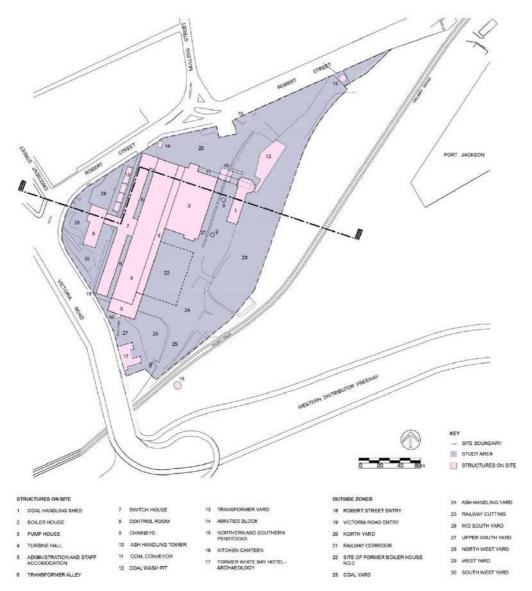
Extract of Figure 1.2.2 from the Conservation Management Plan showing the plan and building and area naming for the White Bay Power Station
